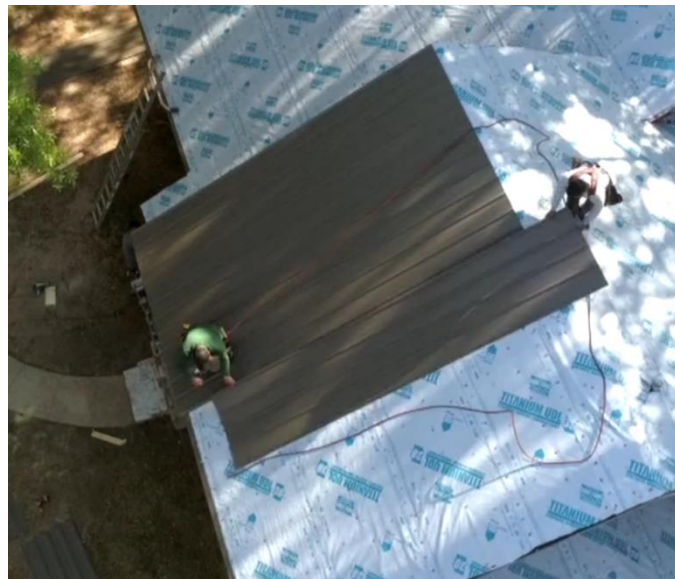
Direct to Deck Insulation, courtesy of the Metal Roofing Alliance
